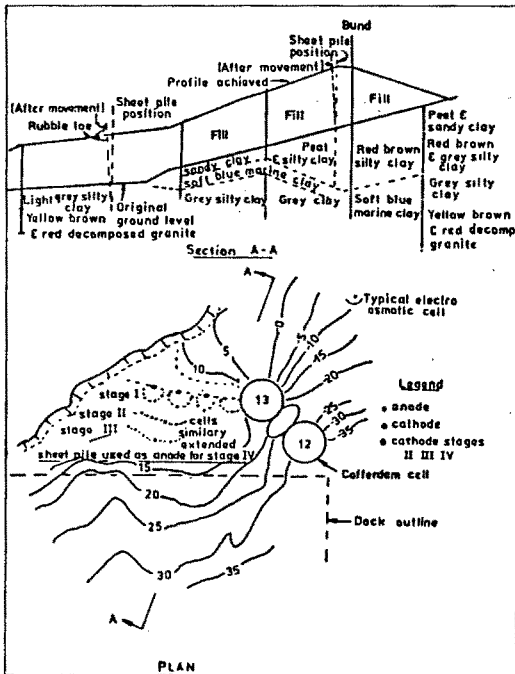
Details of Unstable Embankment Showing Soil Profile and Typical Layout of Electrosmotic Stabilization of Sembawang Shipyard
